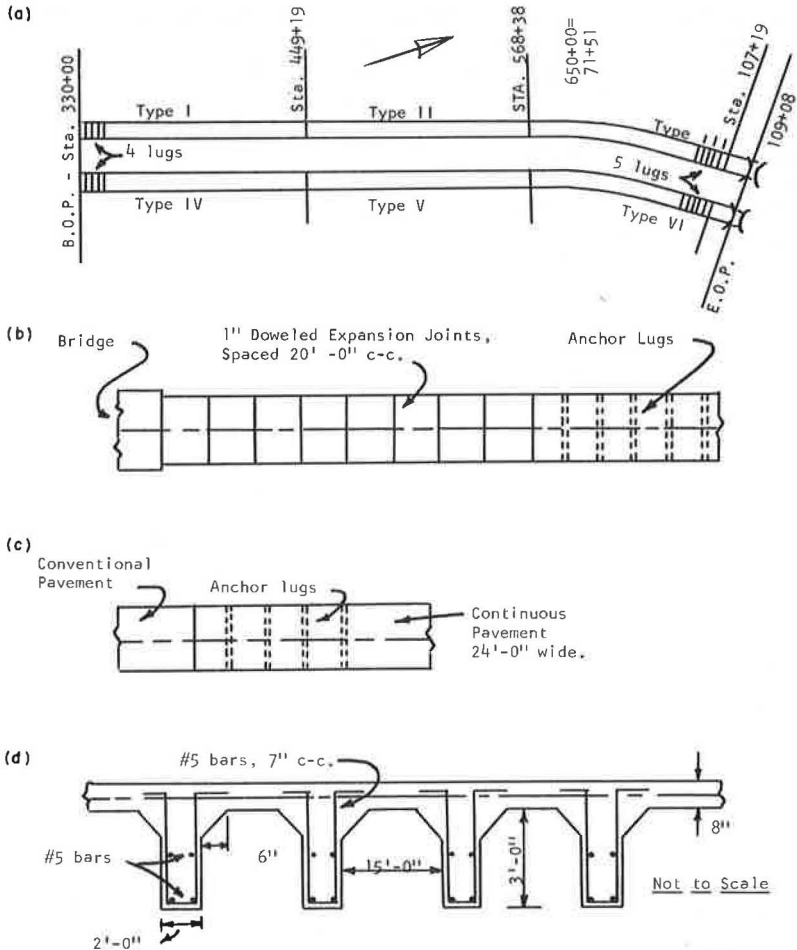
Details of Jones County experimental project (10): (a) plan of experiment variables; (b) pavement terminus of bridge; (c) pavement terminus of conventional pavement; and (d) details of concrete lug anchors.
